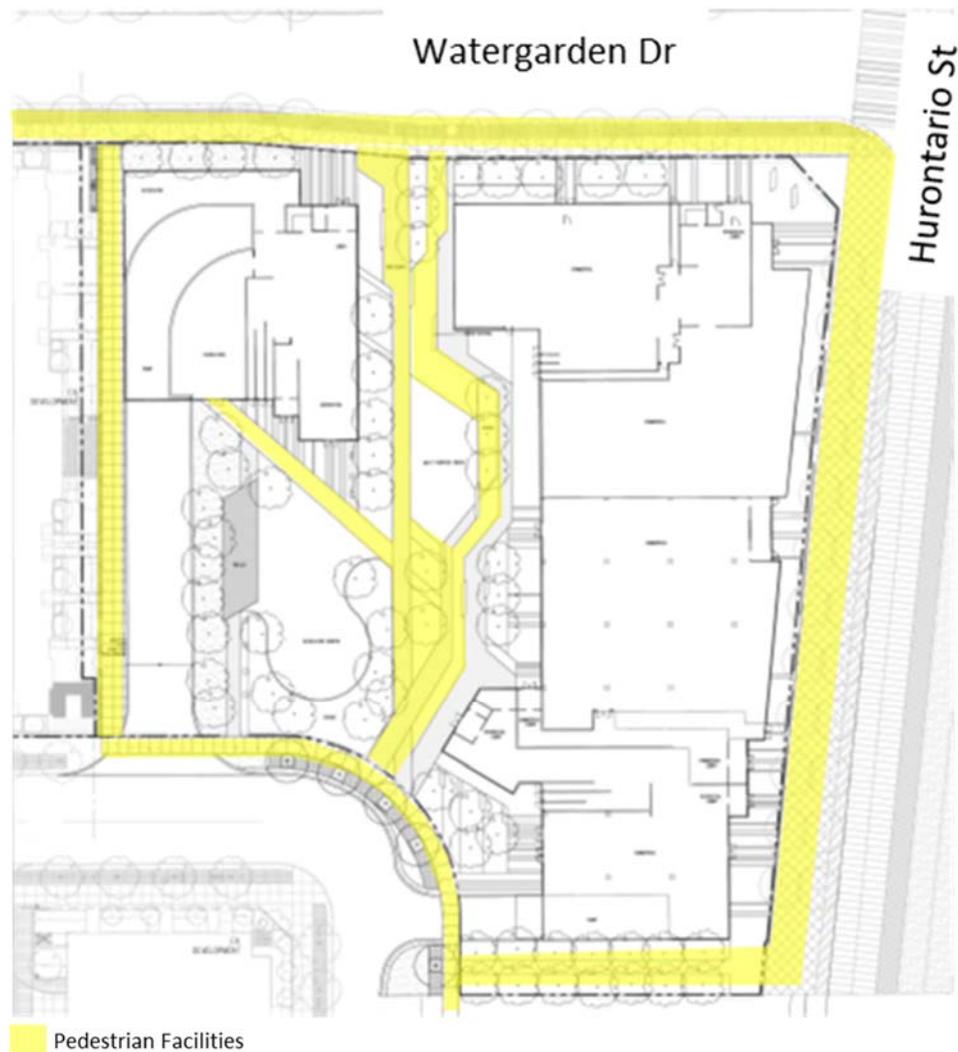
South Side Landscape Plan Depicting Pedestrian and Cycling Facilities
